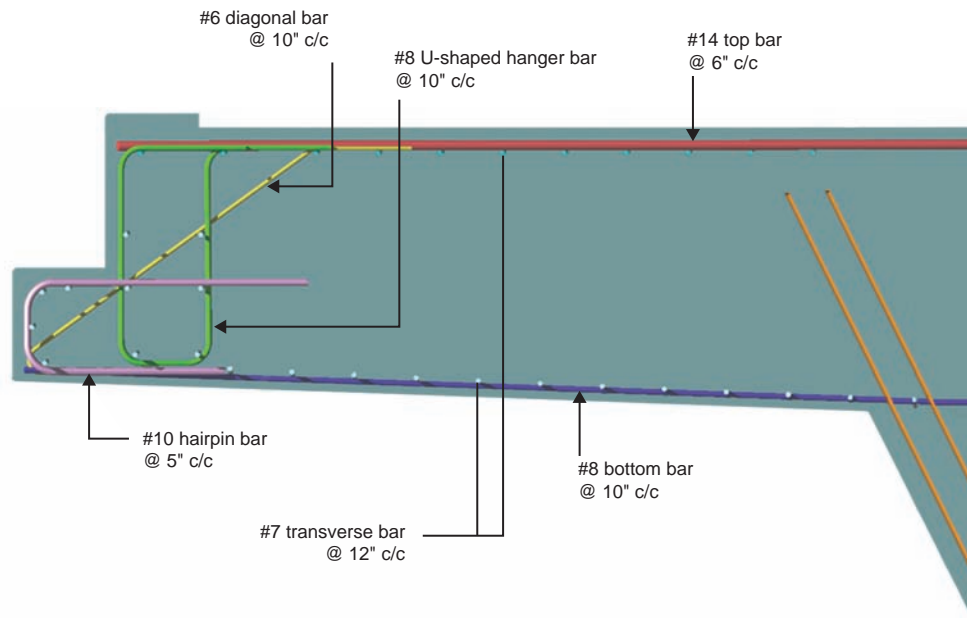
Layout of the Reinforcing Bars in the East Abutment Cantilever as Specified On the As Designed Drawings
